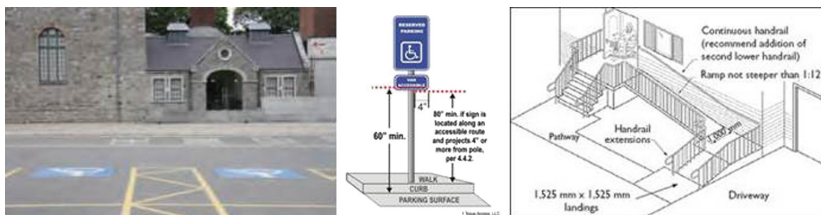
Proposed design solutions: designated accessible parking, ramps, handrails
